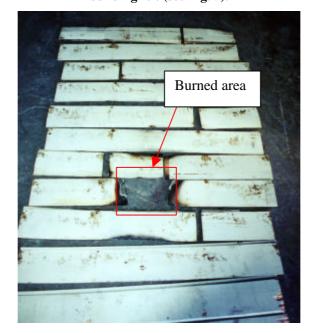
The back of wood siding installed flush against building felt after exposure to a flame impingement source.
